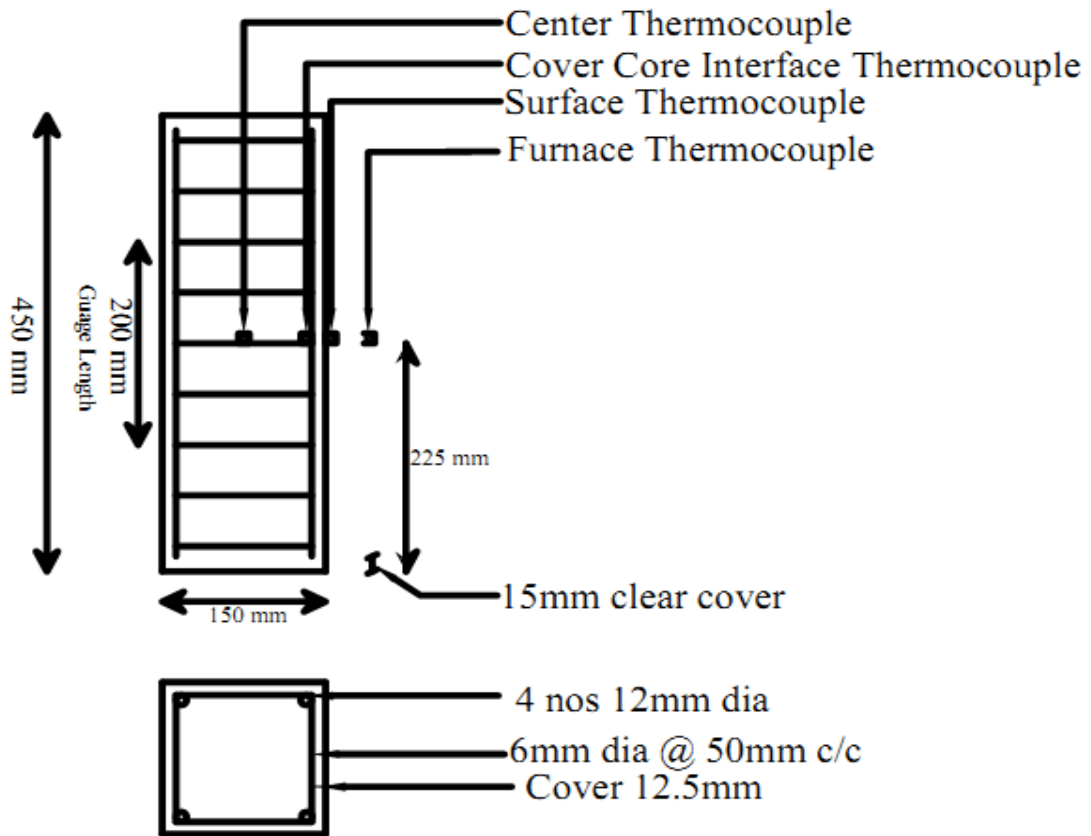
Size of Prisms, reinforcement details and position of thermocouples
